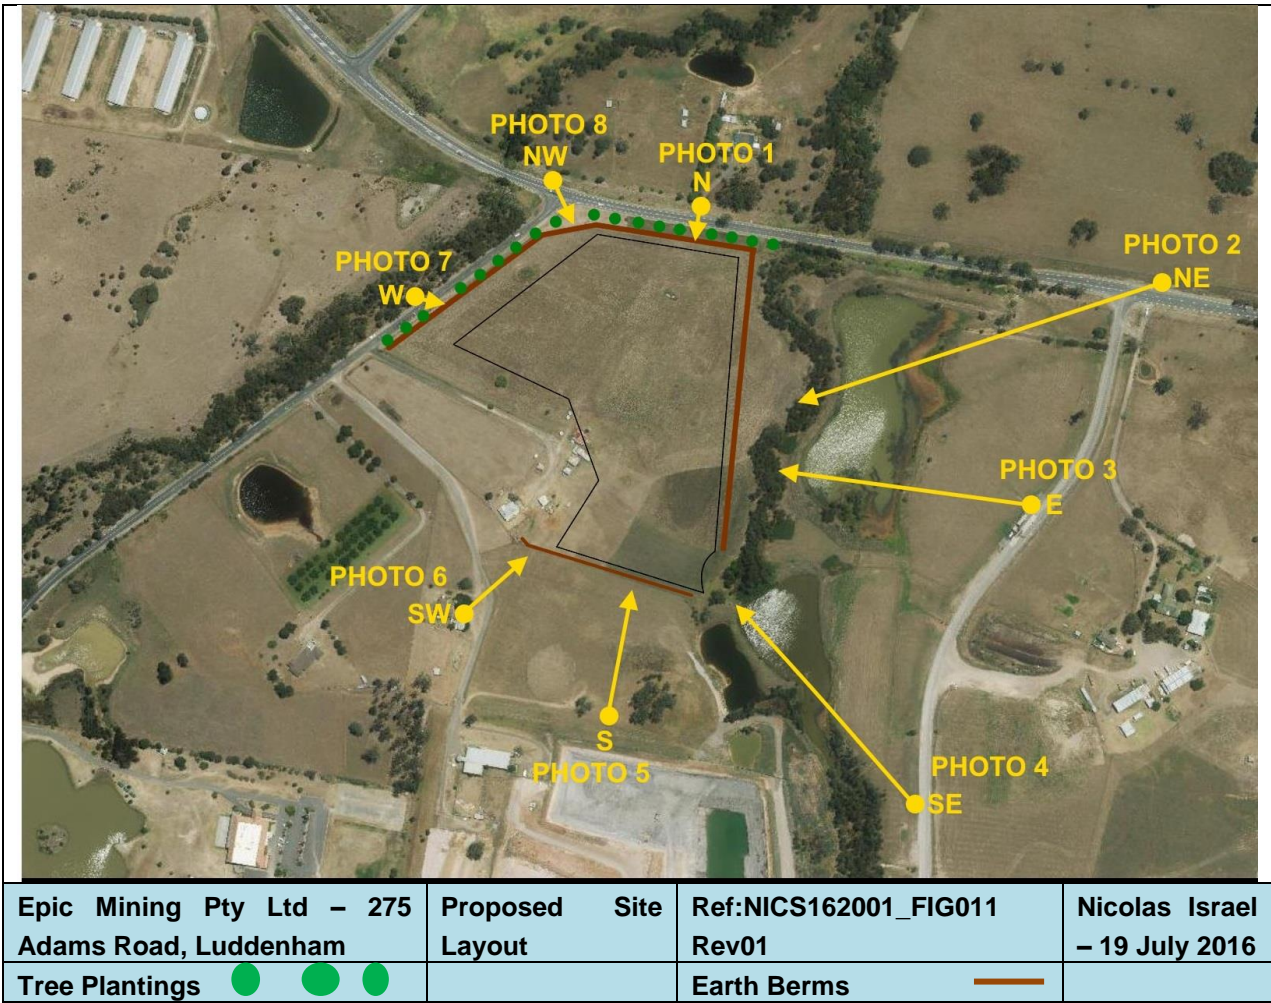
Locations of Proposed Tree Plantings and Landscaped Earth Berms
